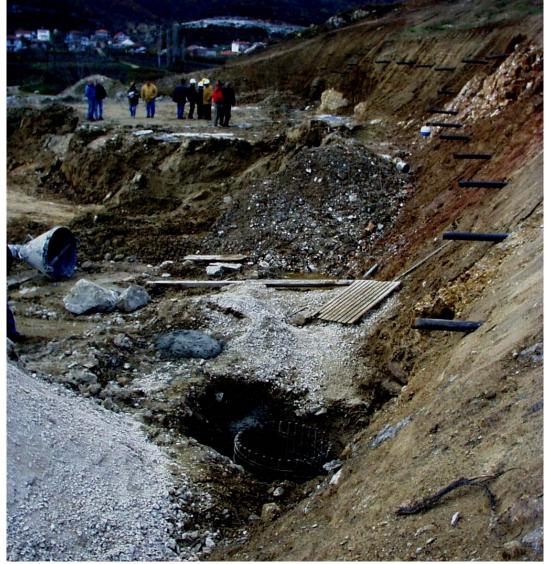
West portal excavation for S4 tunnel. Drainage pipes are shown projecting from the slope and a partially completed cast in place pile is shown in the foreground.
